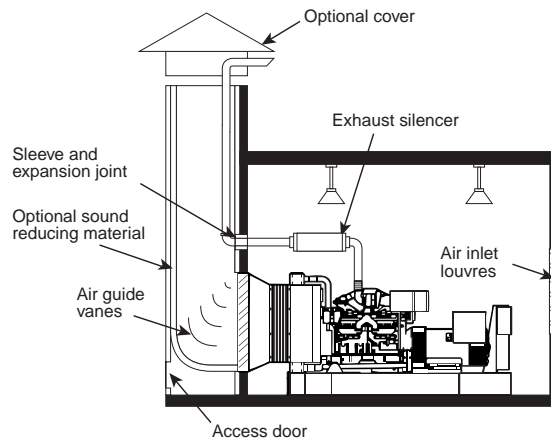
Horizontally mounted exhaust silencer with exhaust pipe and radiator air utilizing common stack.
